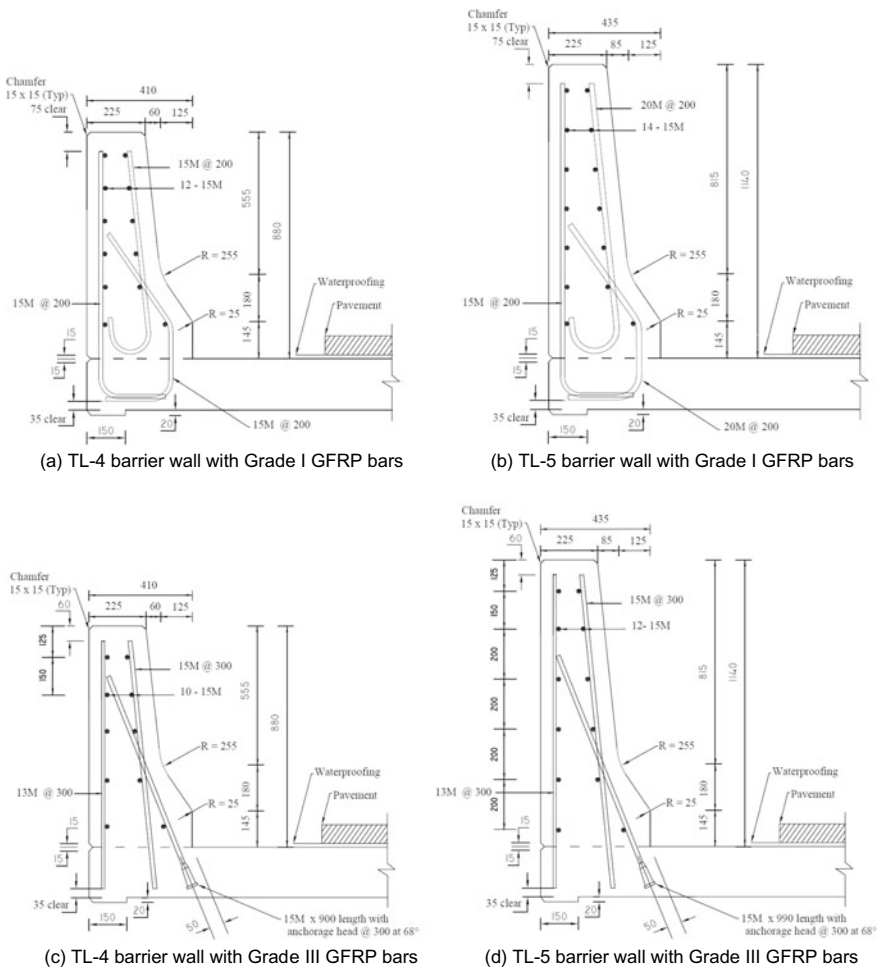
GFRP-reinforced barrier wall details (measurements are in mm)
